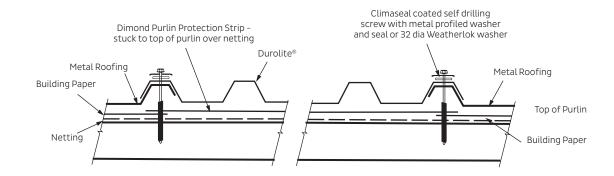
Detail For Single Durolite® Sheet With Dimondek® 400
